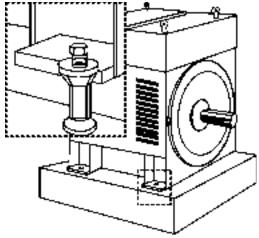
Motor mounted on a concrete base with foundation studs
